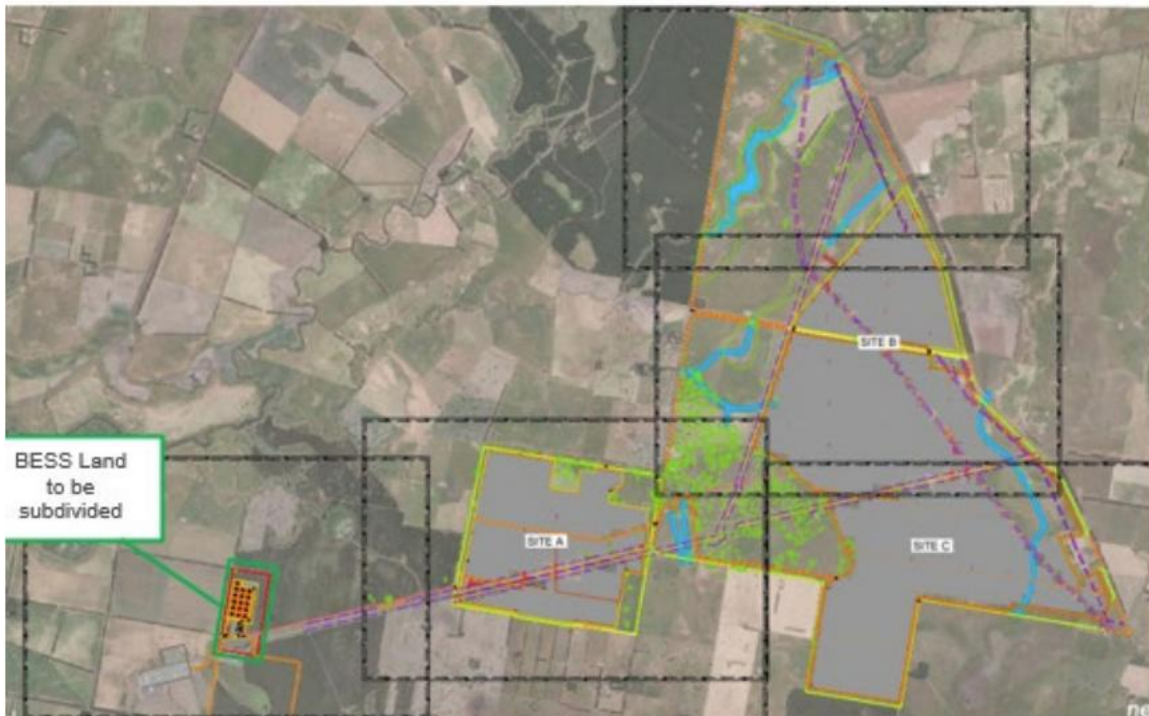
Mortlake Energy Hub Site Plan and (Source: Decision Plans, Urbis, 2024)
